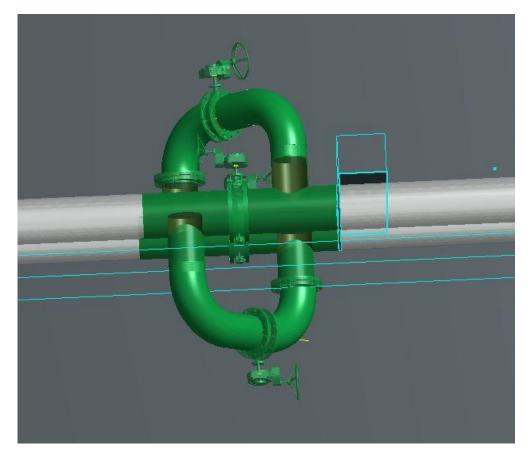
Closeup drawing of crossover pipework (courtesy of Acciona)
